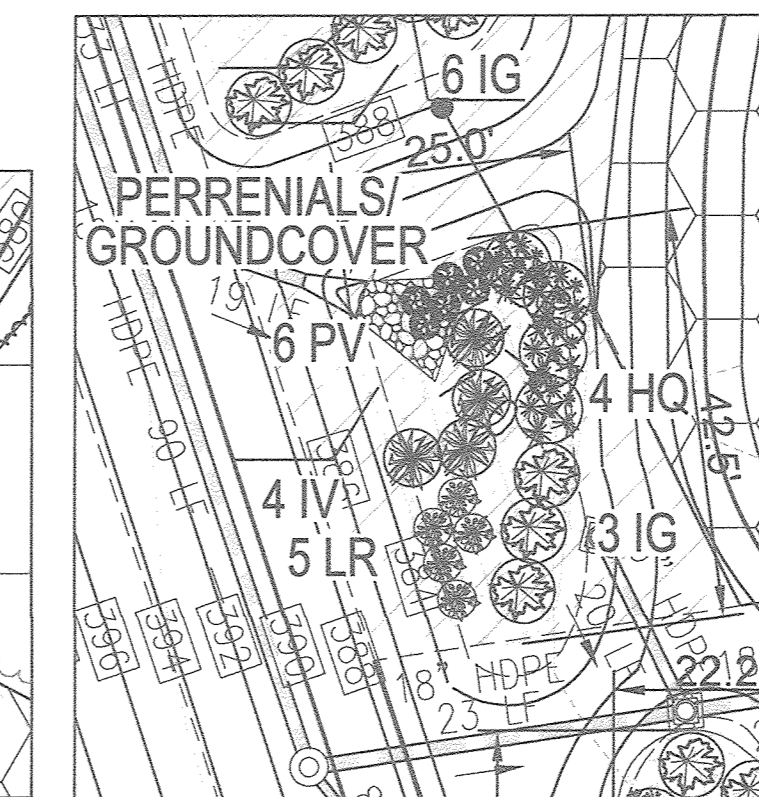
DETAILED BIO AND PLANTING PLAN (SWM #1)
